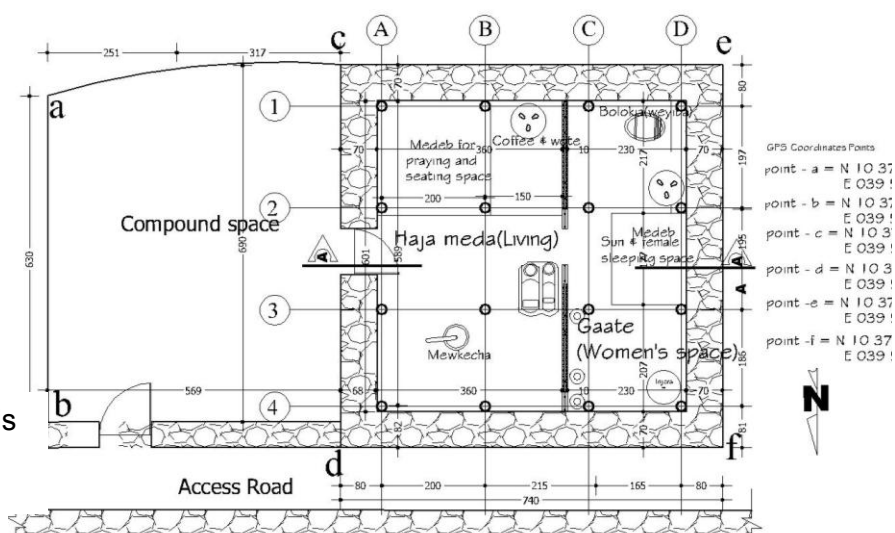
101 Ato Ediris Mohamed's compound & Floor Plan.
